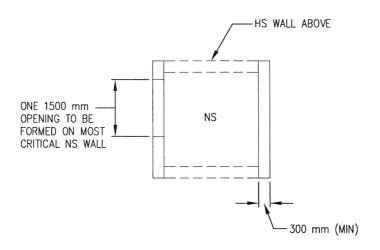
(a) UNSHIELDED NS WALLS
